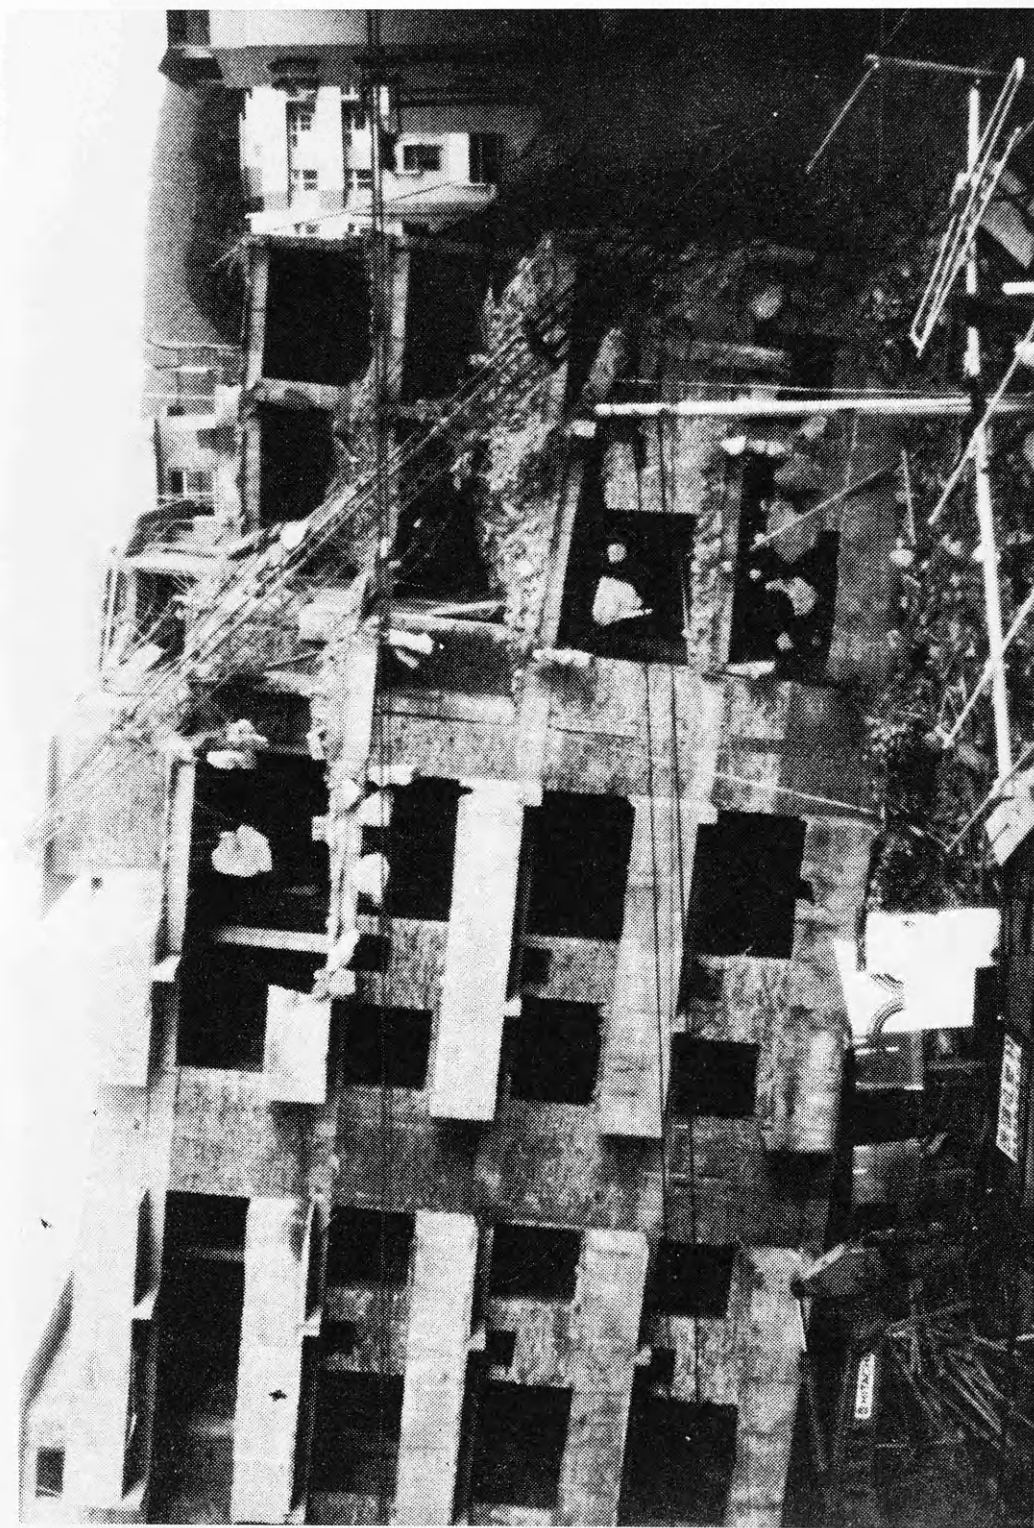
Collapse of a six storey building due to shear and torsion failure of the reinforced concrete ribbed raft foundation, 1979. One corner of the building has sunk 3.5 m. (ref. 8)
